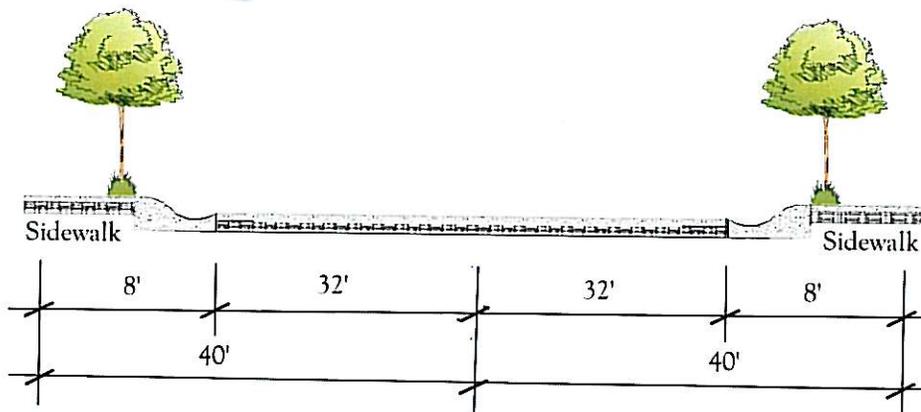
Existing Prototypical Secondary Roadway¹⁴.
